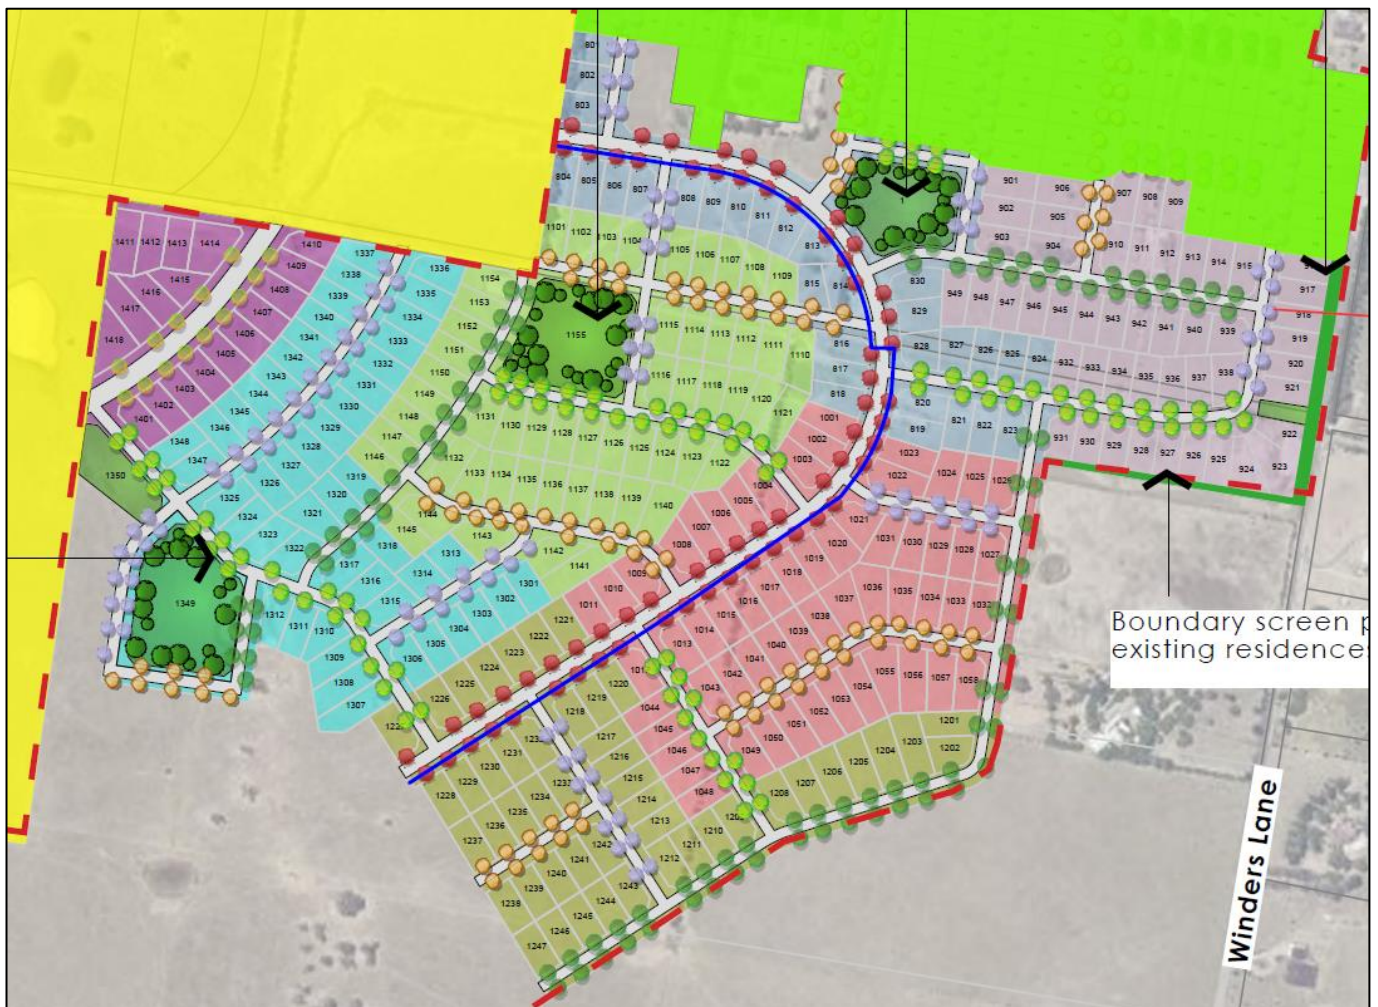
Extract from Landscape Masterplan - Stages 8 to 14 (Source: BRS; 2021)
